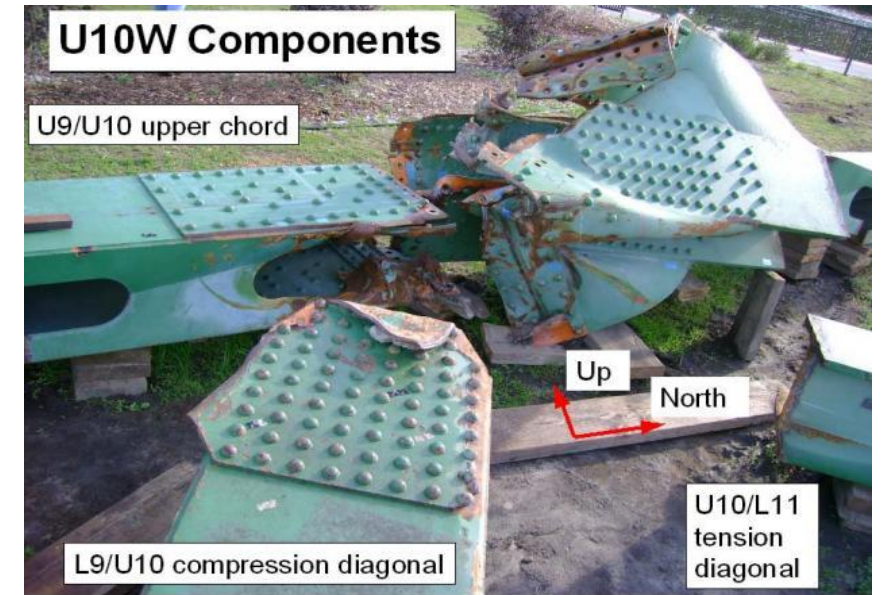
Reconstructed U10W components, looking at the east gusset plate.
